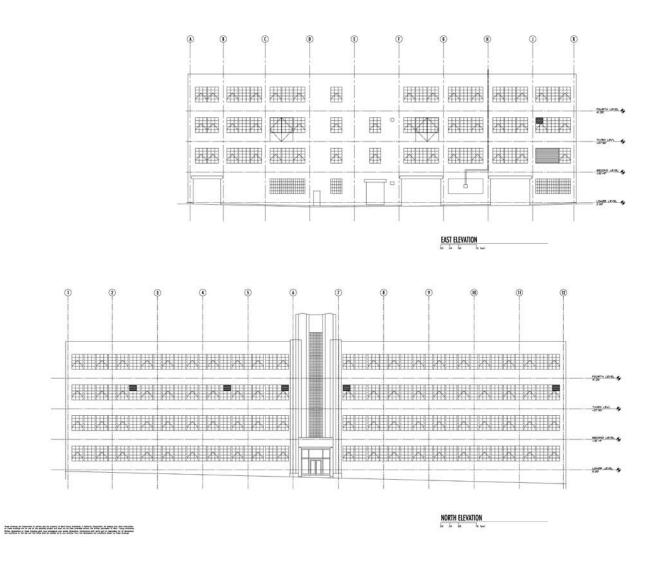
Existing and Proposed North and East Elevations (No exterior changes proposed)
